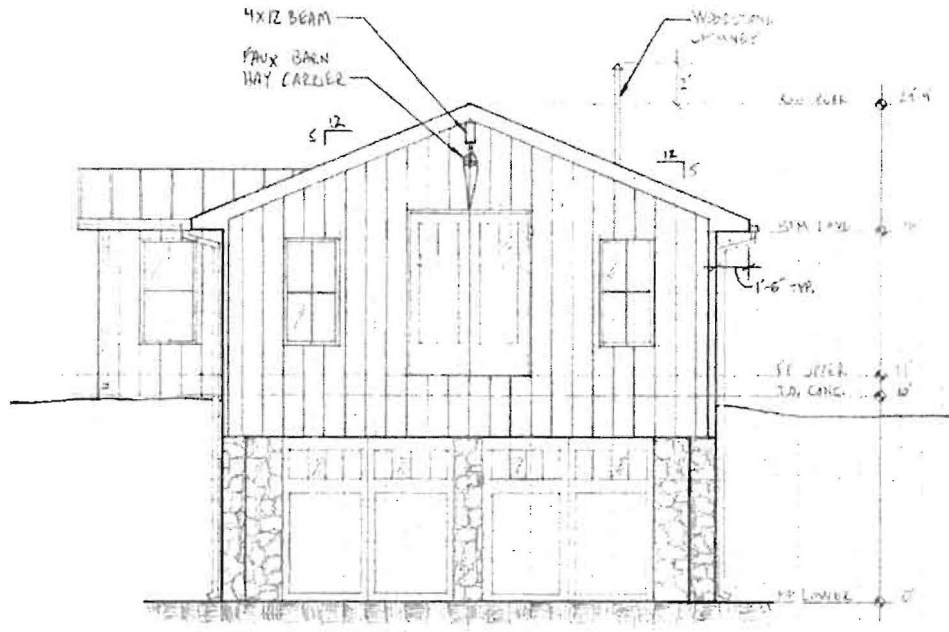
D.1 – Front Elevation, Proposed Bank Barn / Accessory Structure
